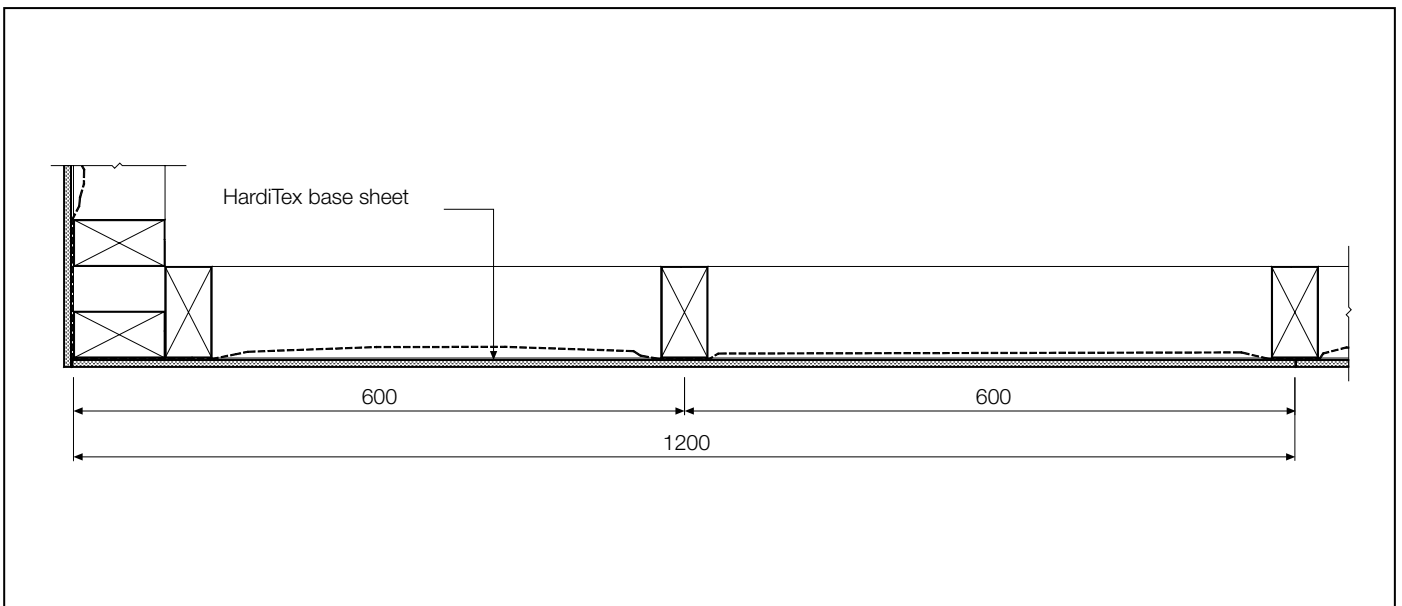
TIMBER FRAMING STUD SET OUT
